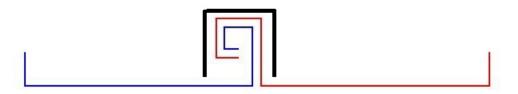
21 16 – 3: Cross Section Roof Panels Standing Seams With Rain Cap
